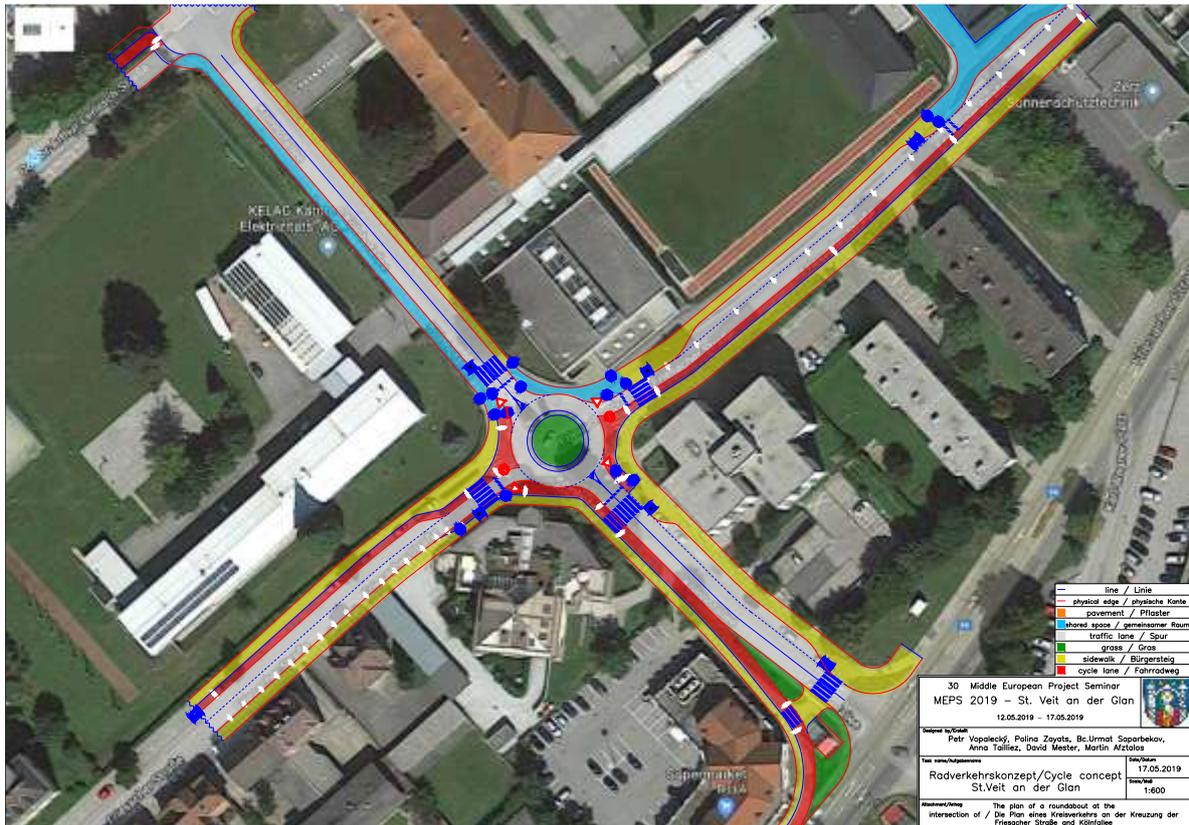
Proposal for a roundabout at the intersection Friesacher Straße # Kölnhofallee
